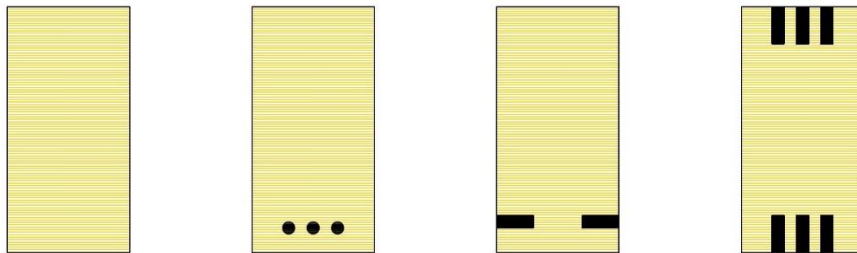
Common arrangements of internal FRP reinforcement on timber beam.
